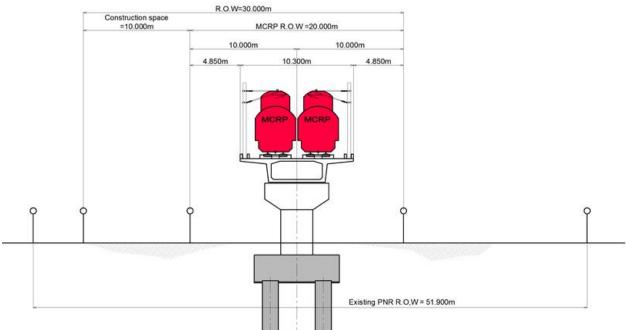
Typical Cross Section between Malolos and San Fernando
